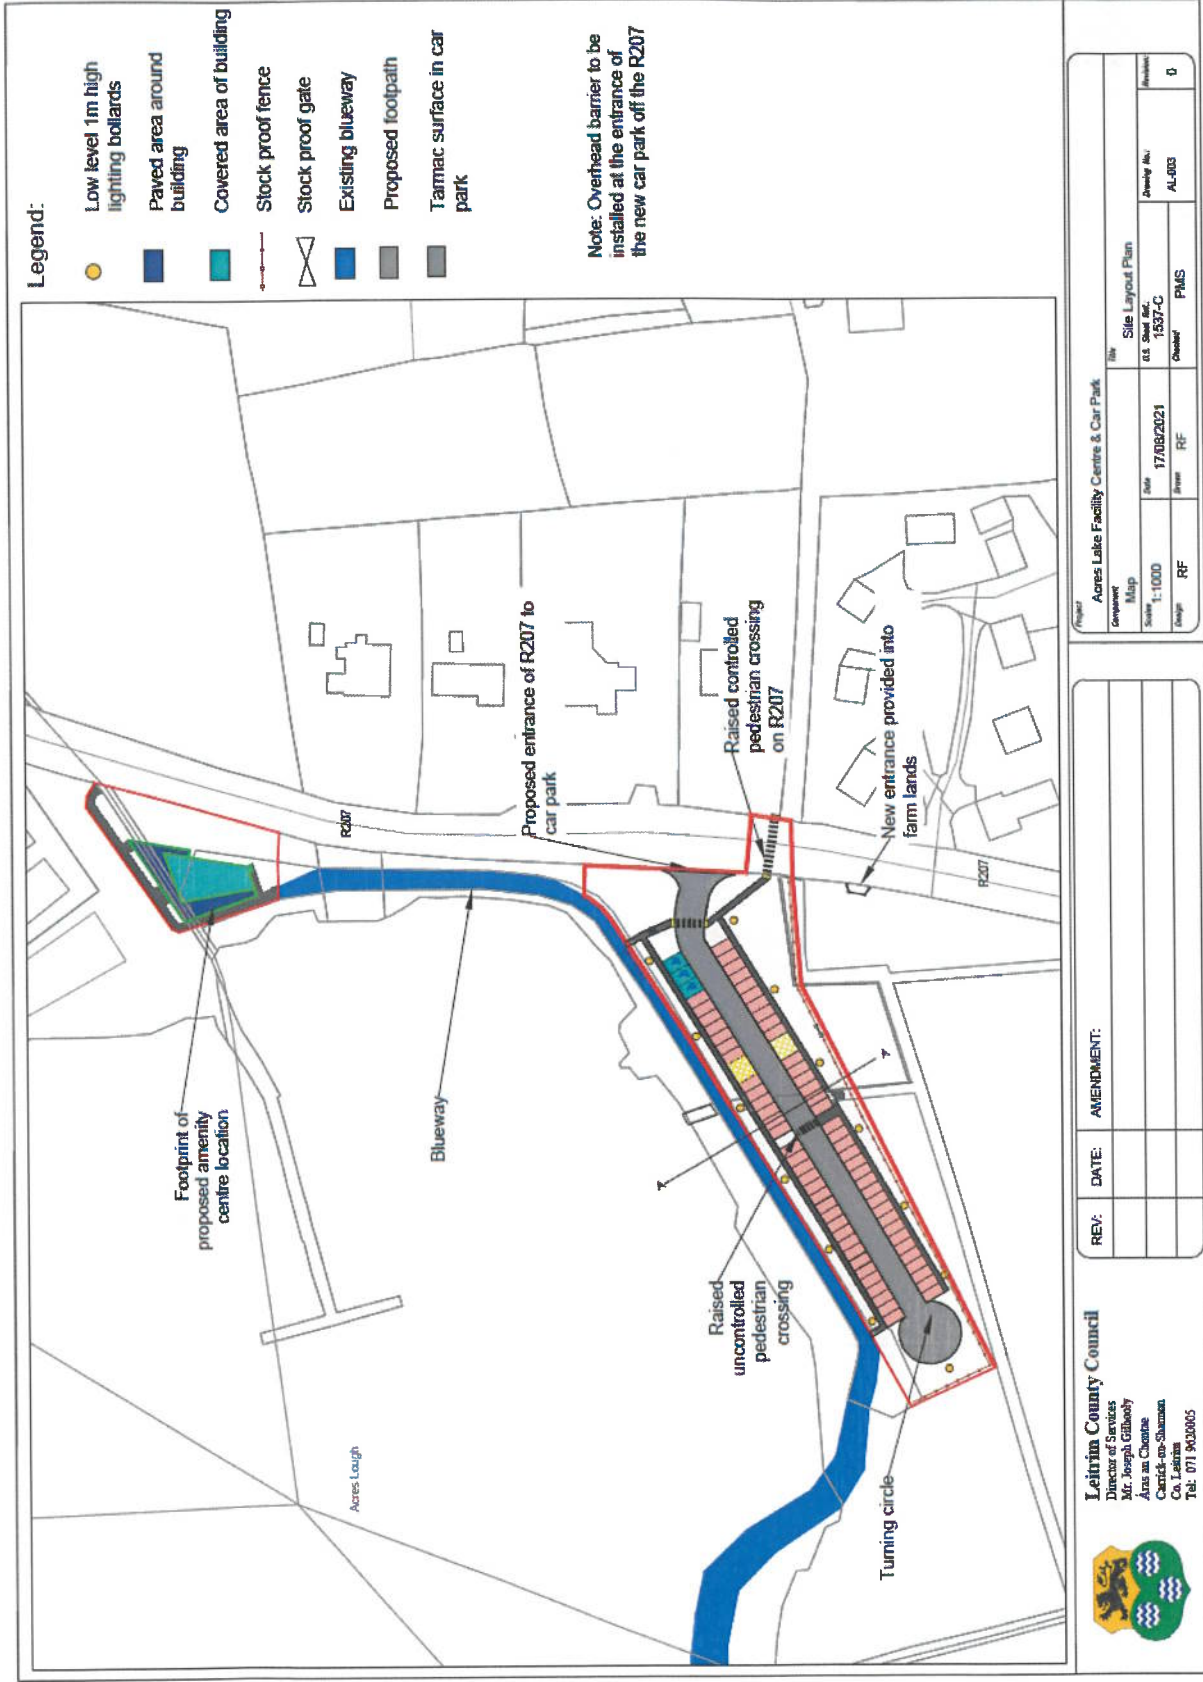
Proposed site layout and location of the facility and associated carparking area
